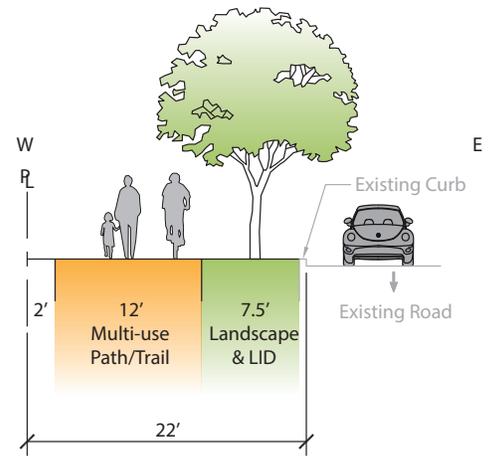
Proposed typical new multi-use trail adjacent to roads.
